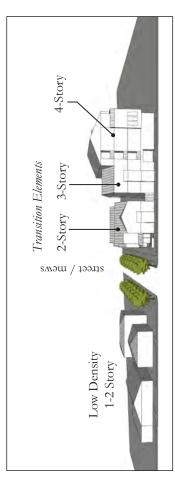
Transitions can also be made by stepping massing down within a project, with lower building elements providing a buffer between taller elements and adjacent lower-density development.
